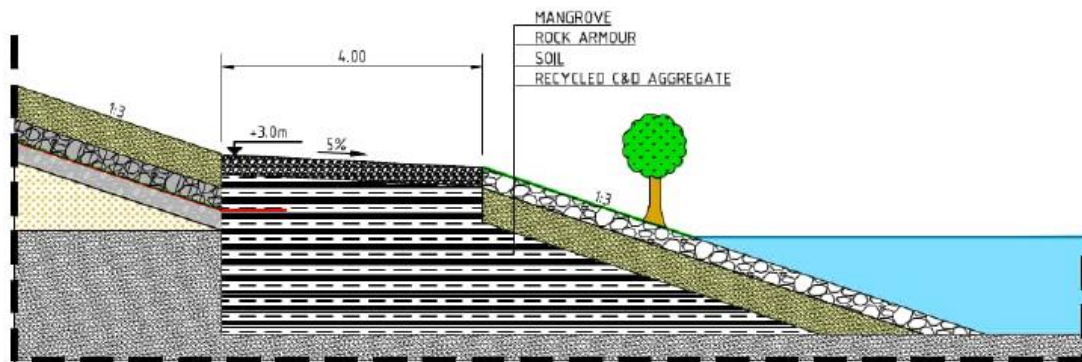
Ring dike cross-section with Stormwater gutter and maintenance road
